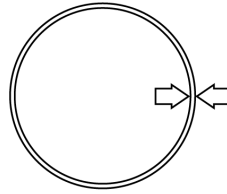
Cross-sectional view of the members with the arrows pointing out the wall thickness
